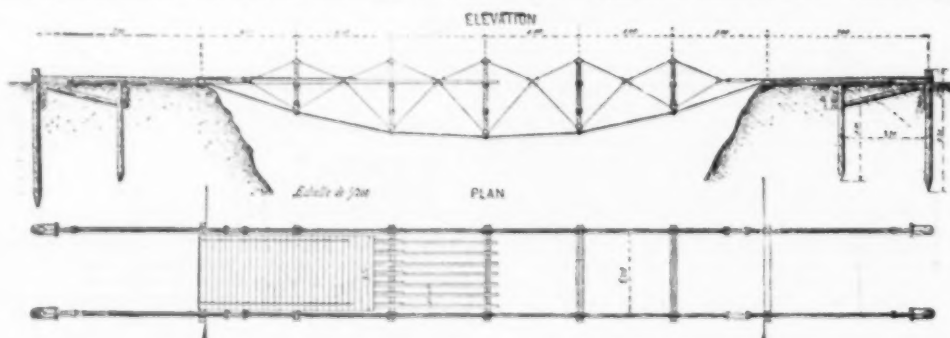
ELEVATION AND PLAN OF THE GISCLARD BRIDGE.
